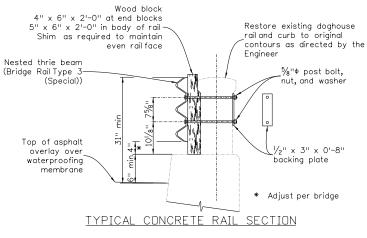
(A)-3 Sample Section showing paving detail and Post Connection
